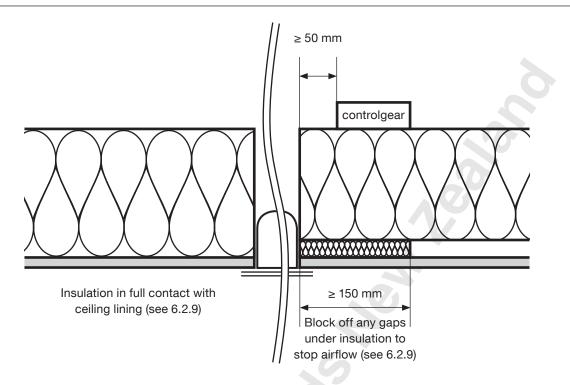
Installing ceiling insulation around recessed luminaires of the type CA 80, CA 90, and CA 135 where the luminaire manufacturer's instructions are not known
